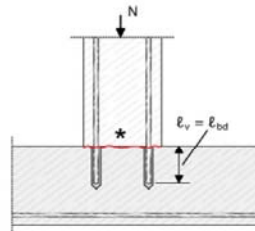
Overlap joint in foundation of a column or wall where the rebars are stressed in tension.
